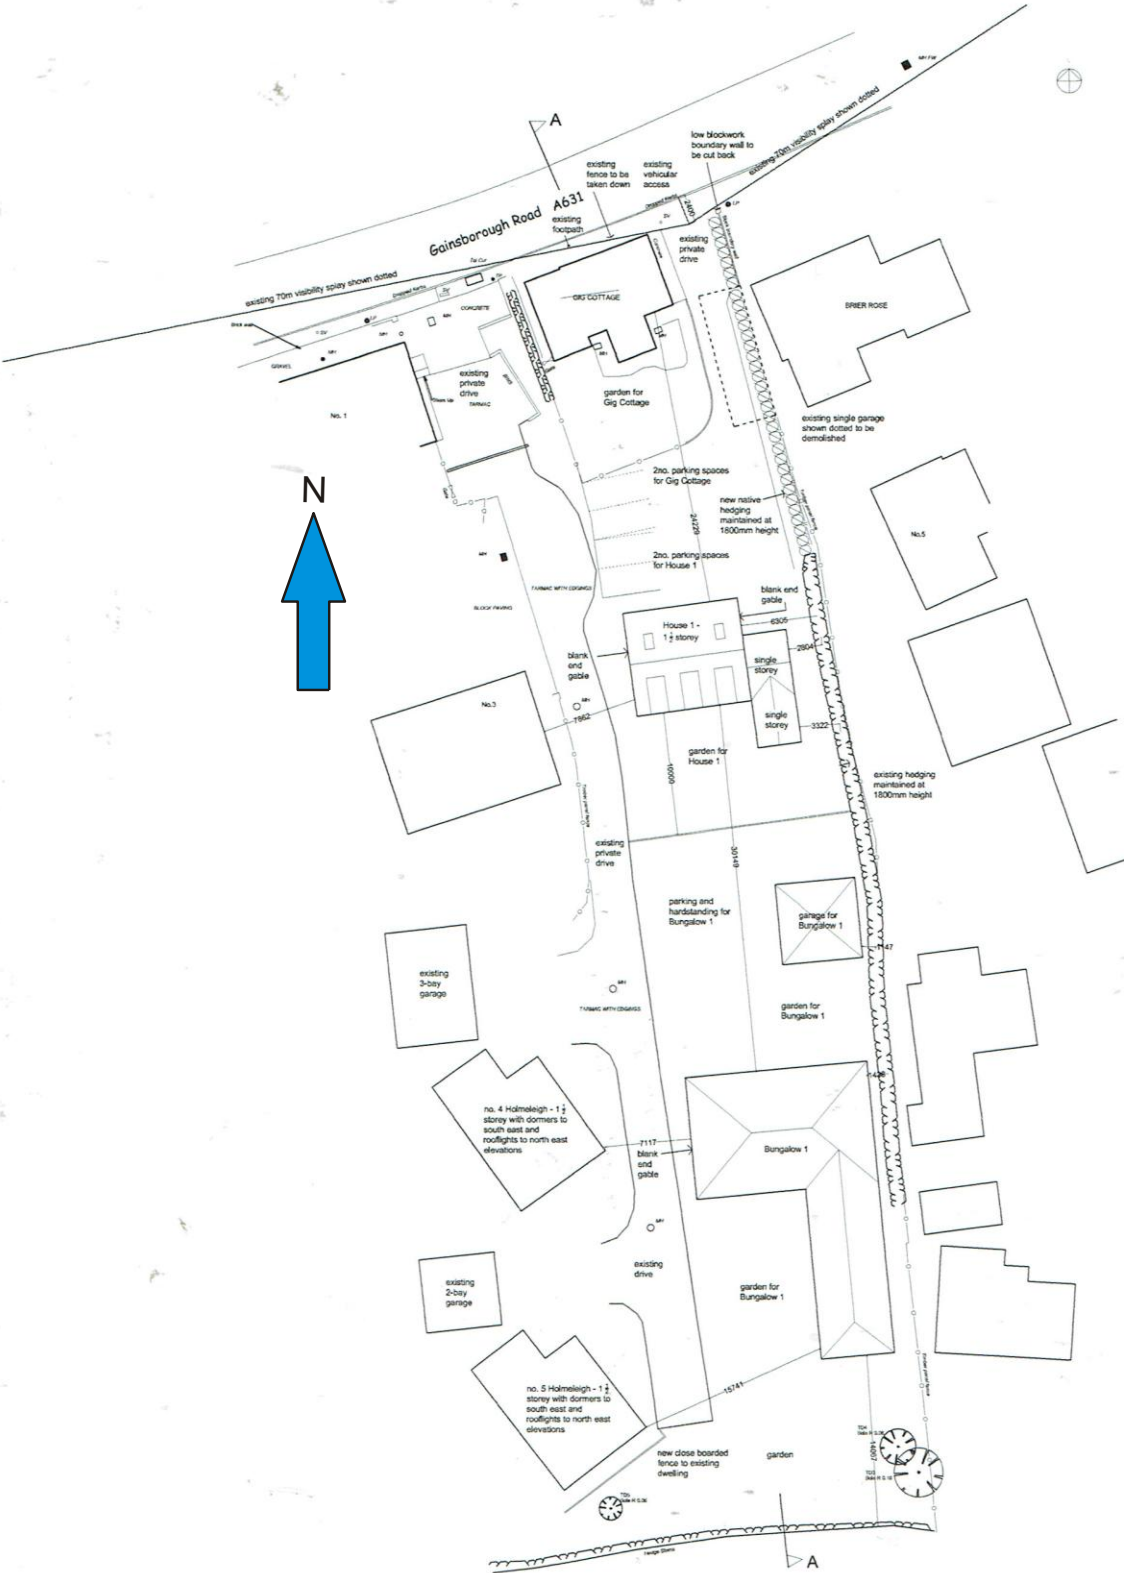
Block plan showing the proposed layout of the development site, (extract from Architects plan)
